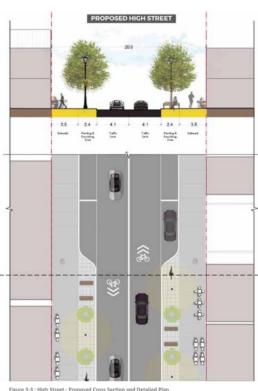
High Street - Proposed Cross Section and Detailed Plan
